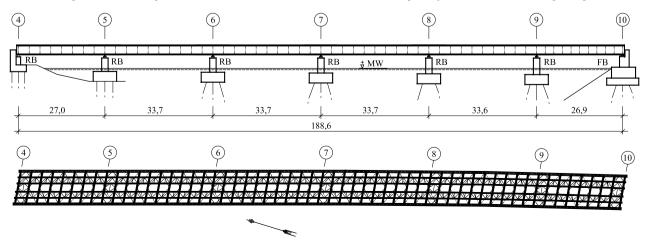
Elevation and plan of the Söderström bridge. RB indicates roller bearings and FB indicates fixed bearings.
